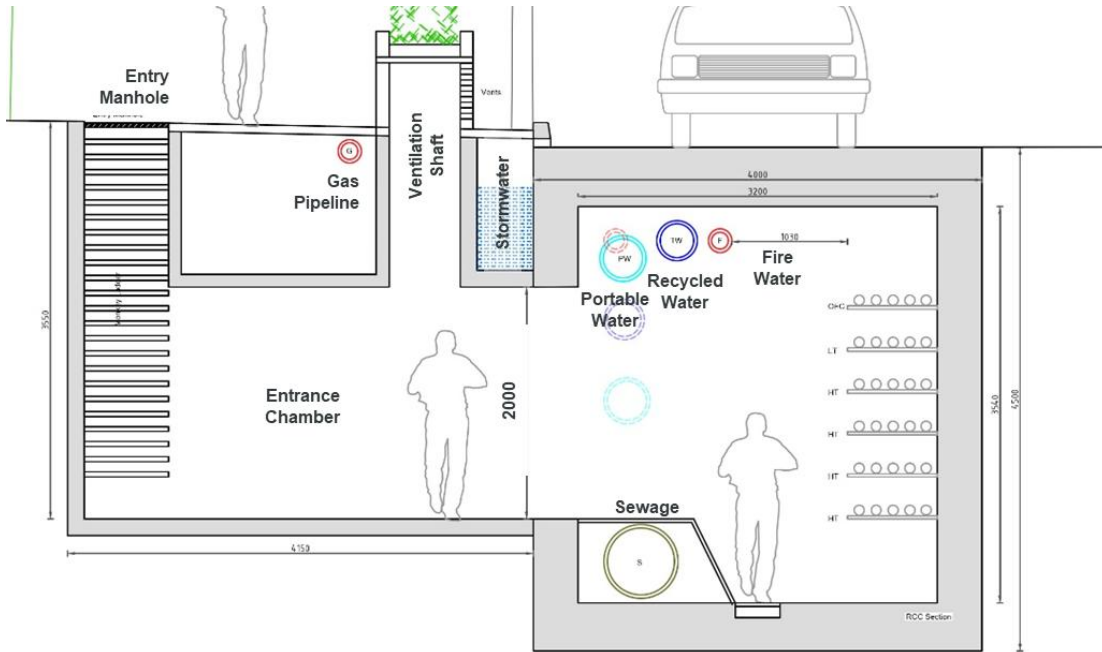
Proposed Multi Utility Tunnel Entrance Section
